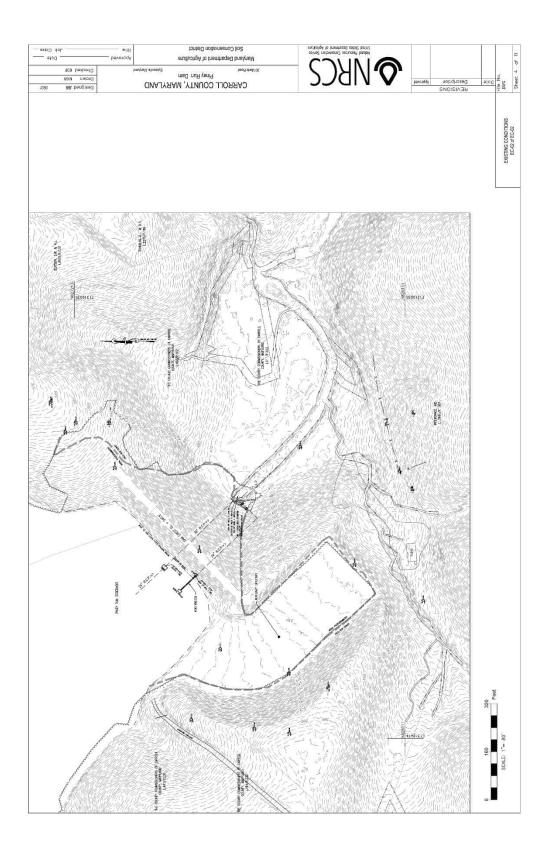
Piney Run Dam Alternative 1 Site Plan
